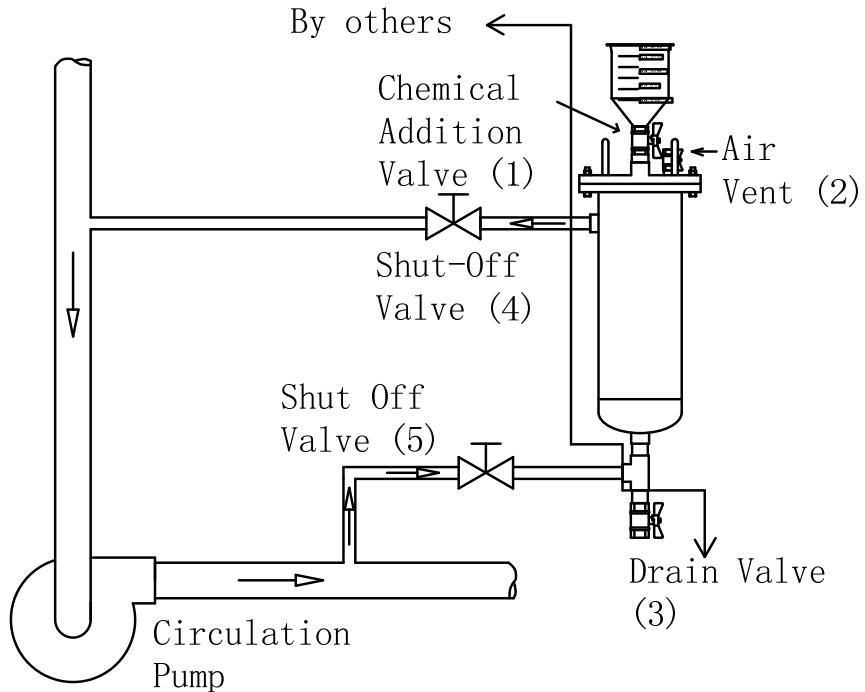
Installation method 1 – CBF-HP installed in parallel with the system pump
